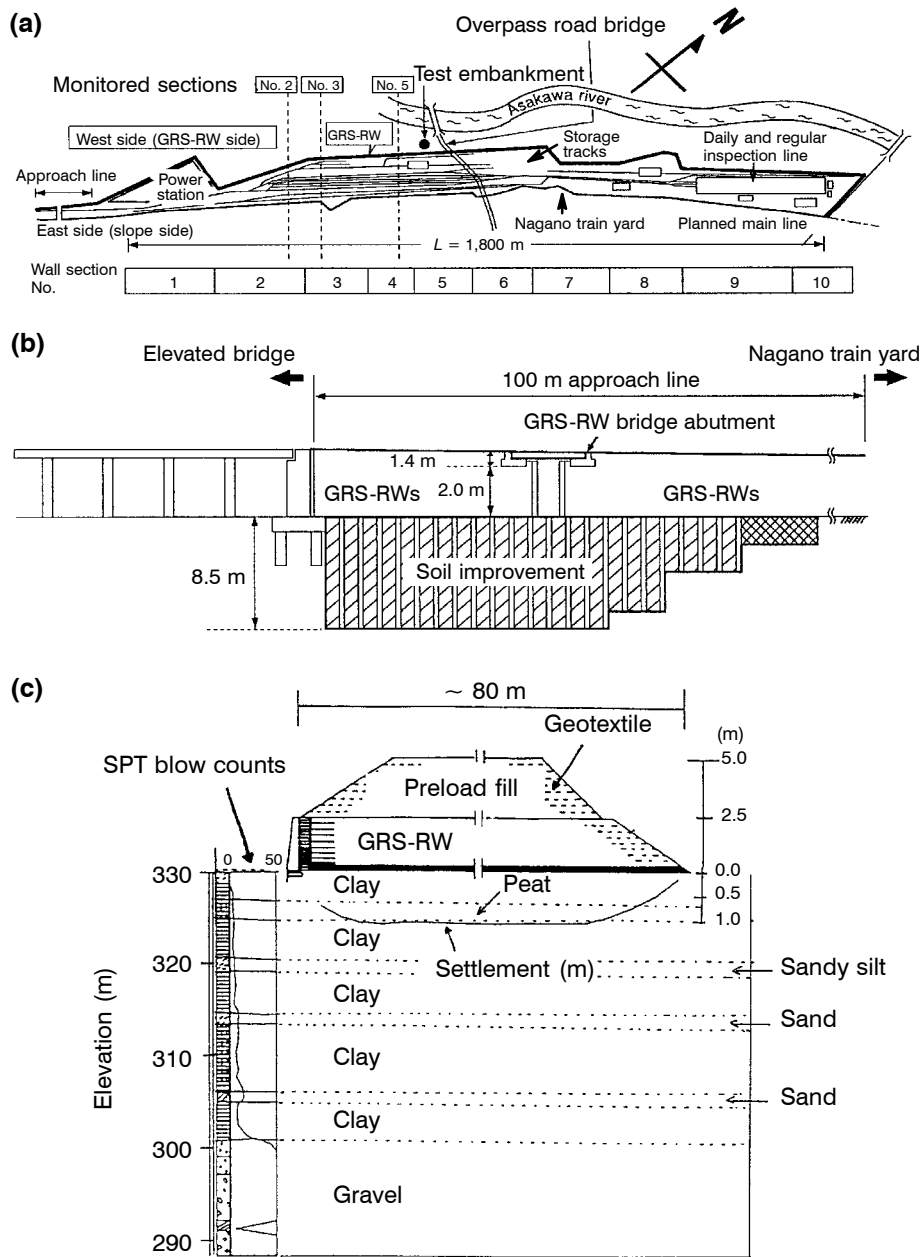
Nagano GRS-RW with a FHR facing for the Hokuriku Shinkansen (bullet train) north of Nagano City: (a) plan view of the train yard; (b) longitudinal section of the approach fill to the train yard; (c) typical cross section of an embankment with a GRS-RW in the train yard.
